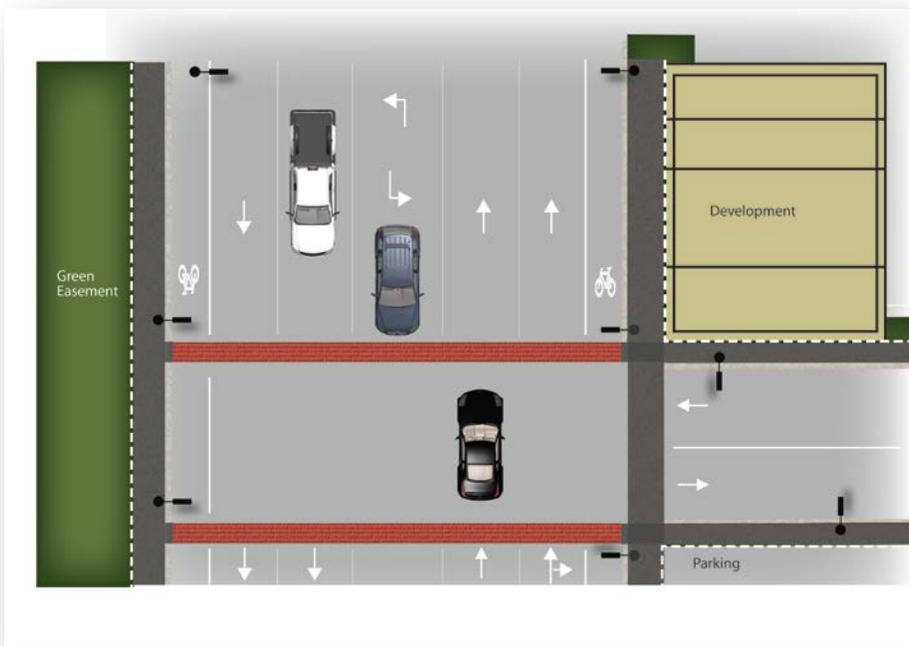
Improved Street Site Plan – 80'– Russell Street to Young Street / Business 50
